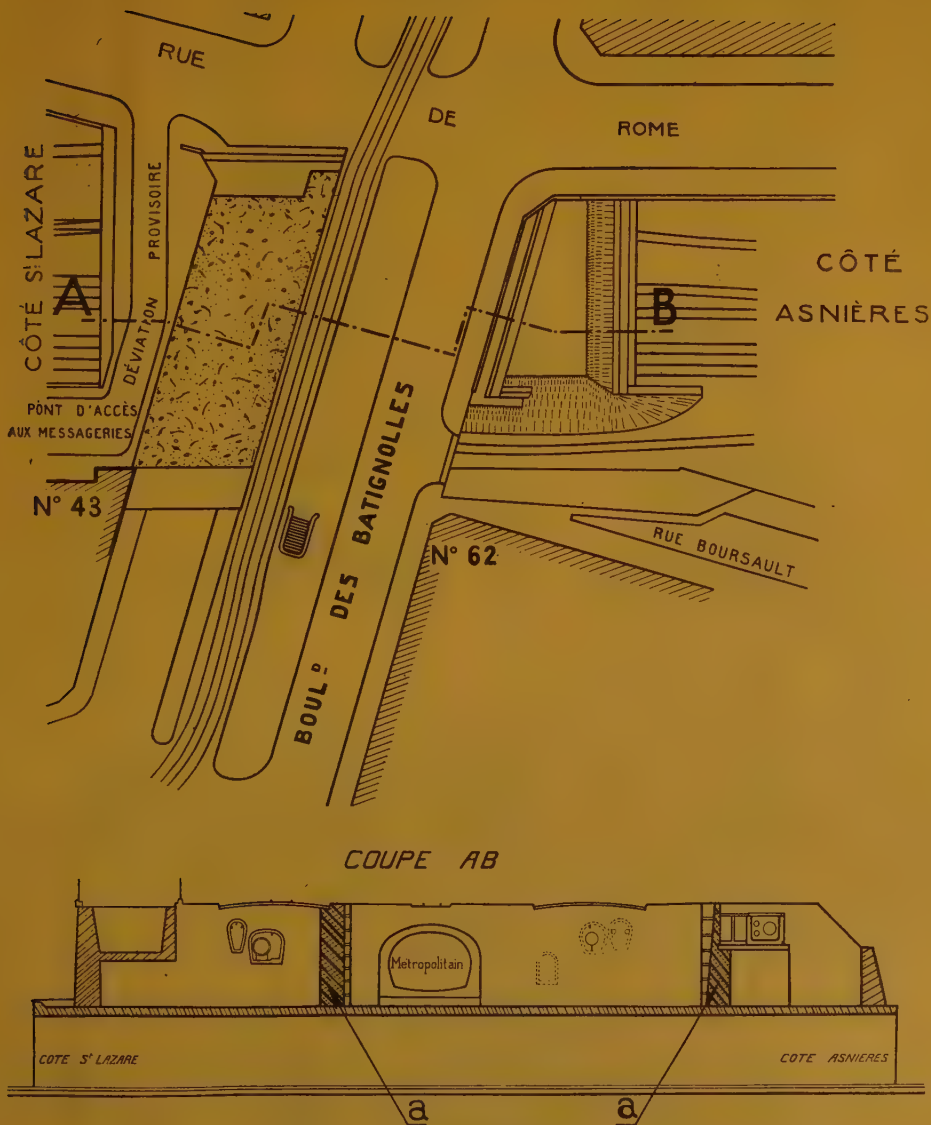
Construction of Batignolles bridge. — Preparatory work.
